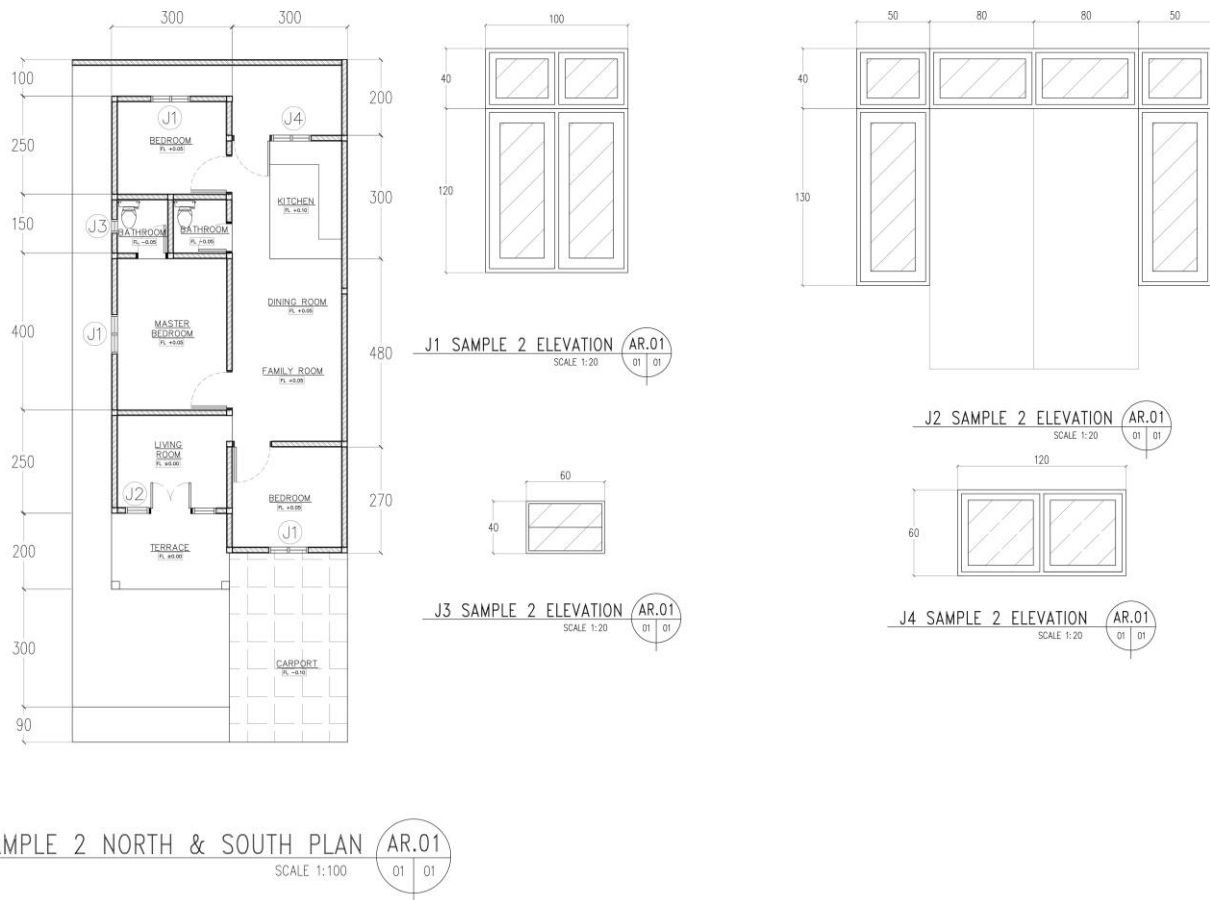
(a) Sample 2 North & South Plan, (b) Openings Detail and Elevation of Sample 2 House (North & South)
